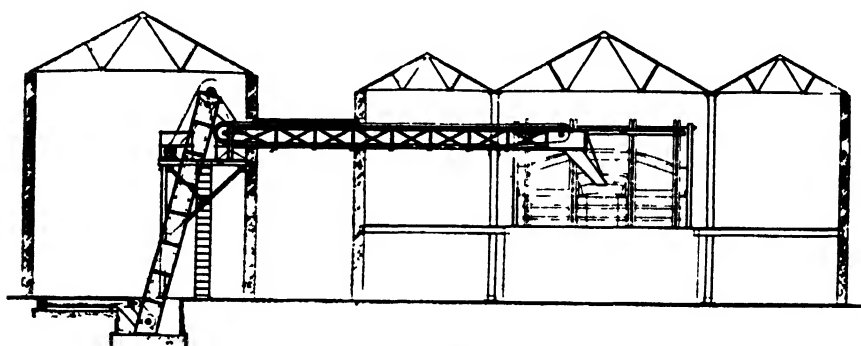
A BATCH ELEVATOR AND CONVEYER.
